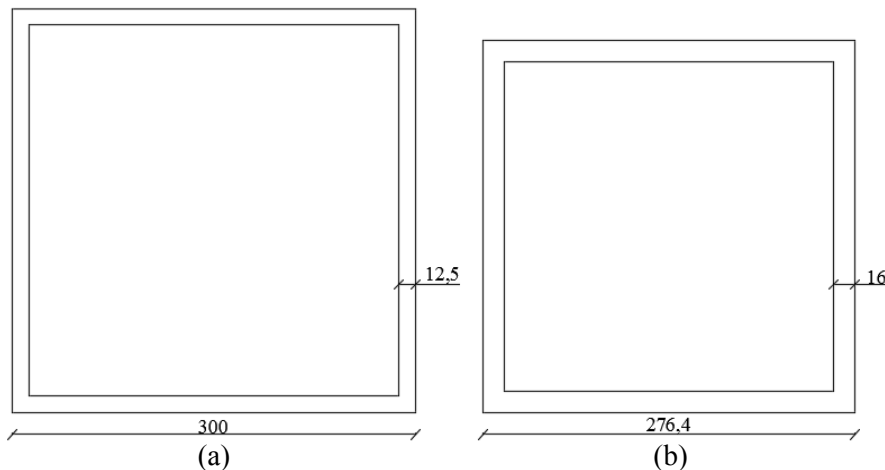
Reference column in the existing structure (a) and optimized column area cross section in S690 steel for a 23086 mm long column.
